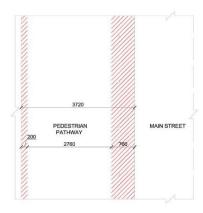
Street width and buffer spaces (in mm) for Gateway 12 in the area surrounding Frankfurt am Main Hauptbahnhof
